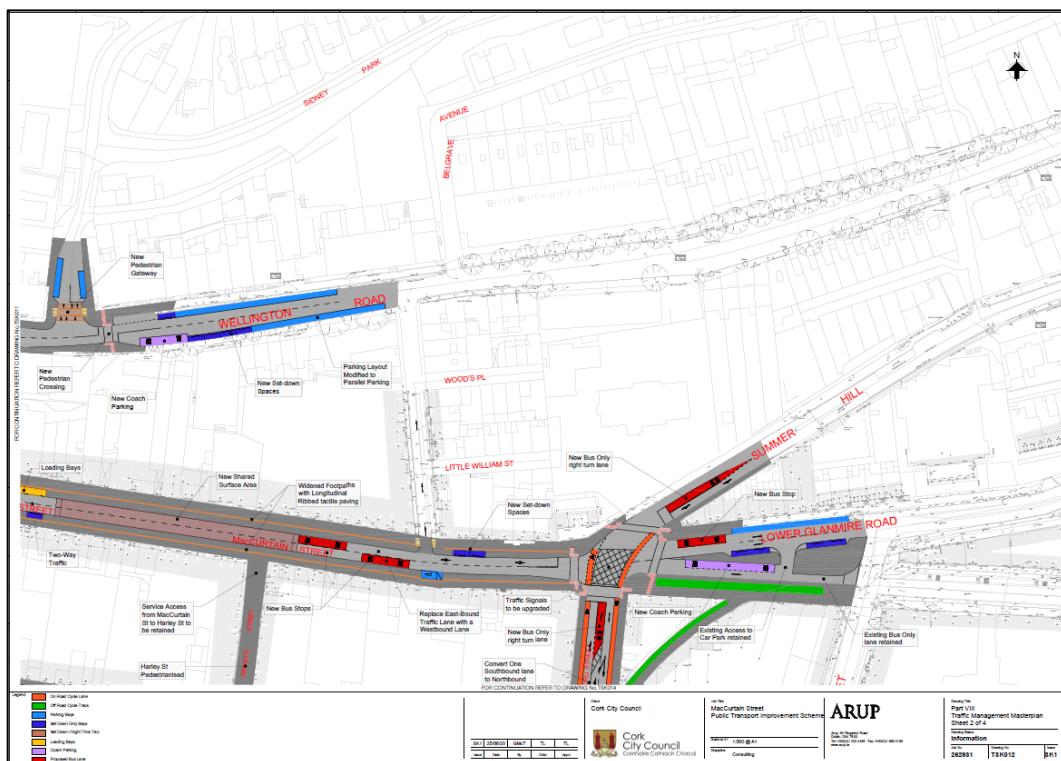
Street improvement works – Sheet 3 of 4 | Not to Scale
